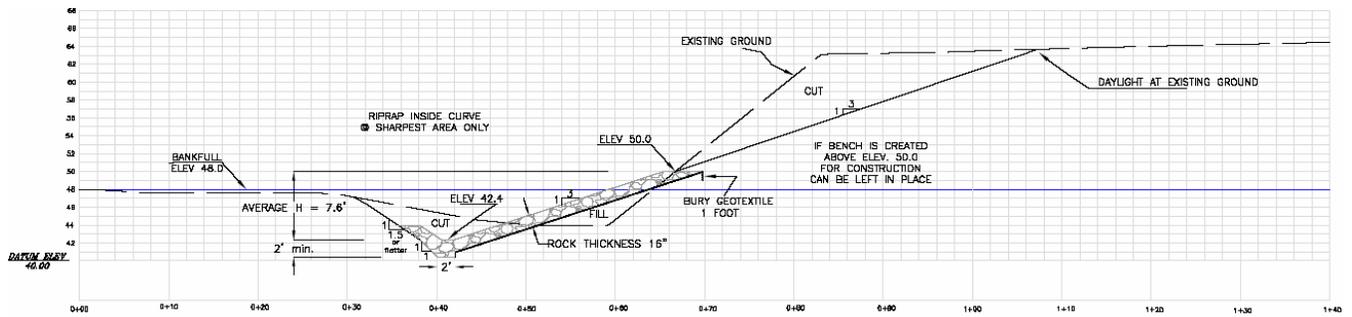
Stream cross-section showing proposed rock riprap and banksloping.
